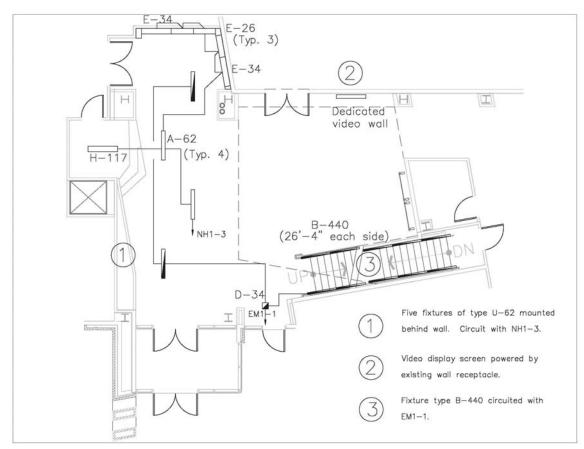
Atrium – First Floor Lighting Layout and Circuiting
